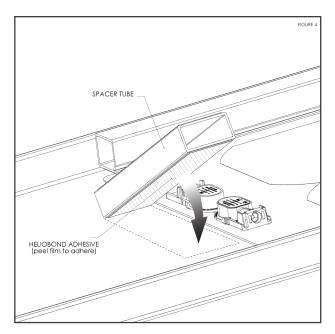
Shows the spacer tube installed with the first module on the standing seam.
